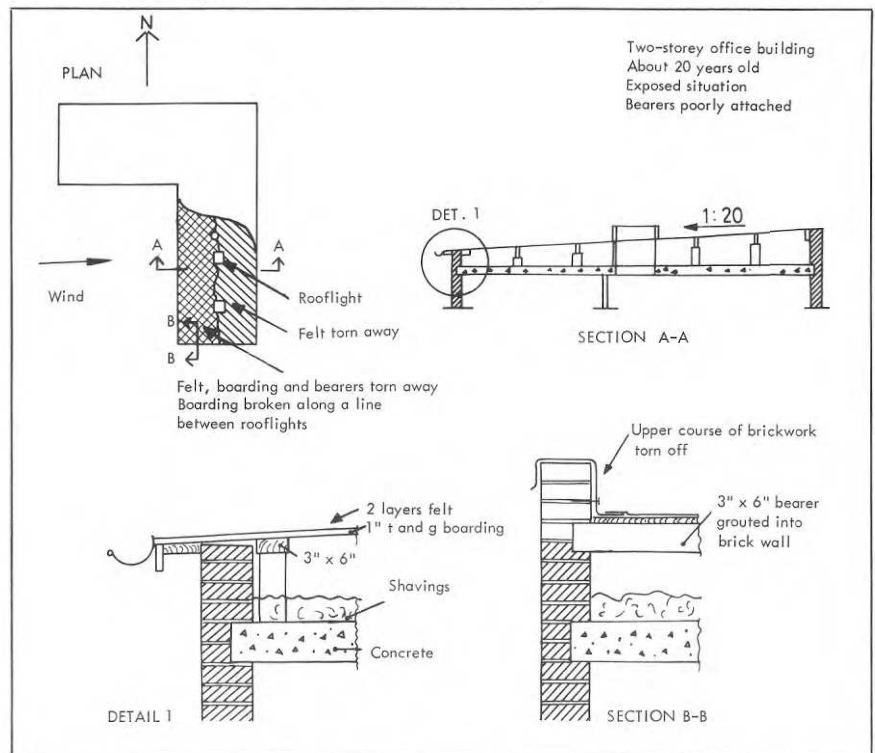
Example of total roof damage. The only anchorage seems to have been the grouting of the bearers in the brick gables. The roof has lifted along one longer side and pulled away the top course of bricks at the gable. At the middle of the roof were a few rooflights and ventilation shafts to which certain of the bearers were attached. The boarding has therefore broken at some point between the rooflights. On the lee side of the rooflights, only the felt and small areas of boarding were torn away.
